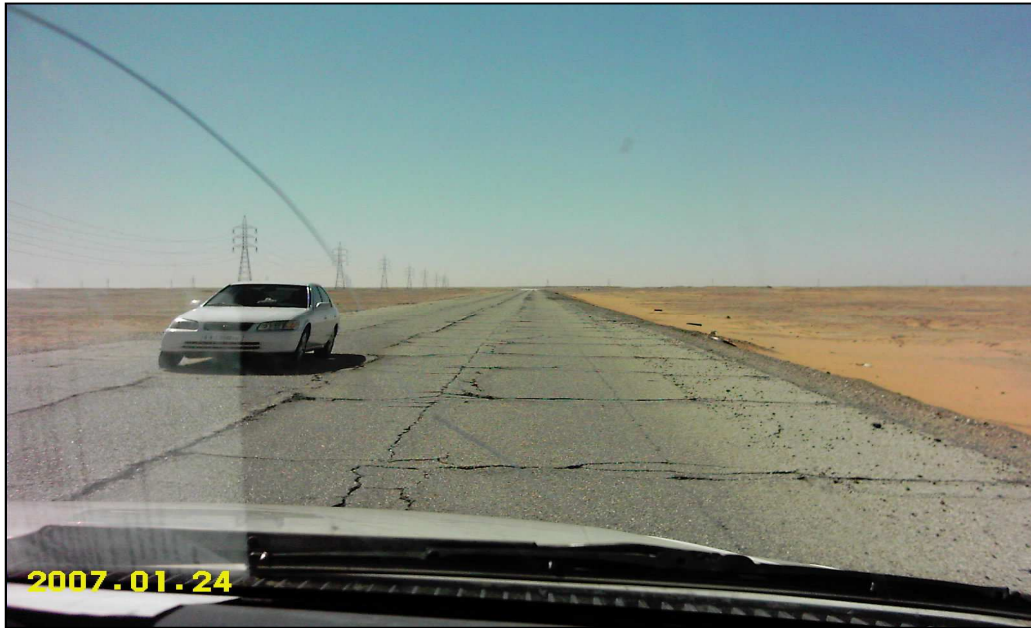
Longitudinal and transverse cracking distress in Libyan roads
